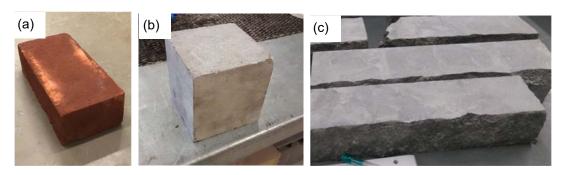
Masonry units used for testing: (a) Moulded full clay bricks, (b) Sawn limestone cubes, and (c) Limestone blocks cut by guillotine
